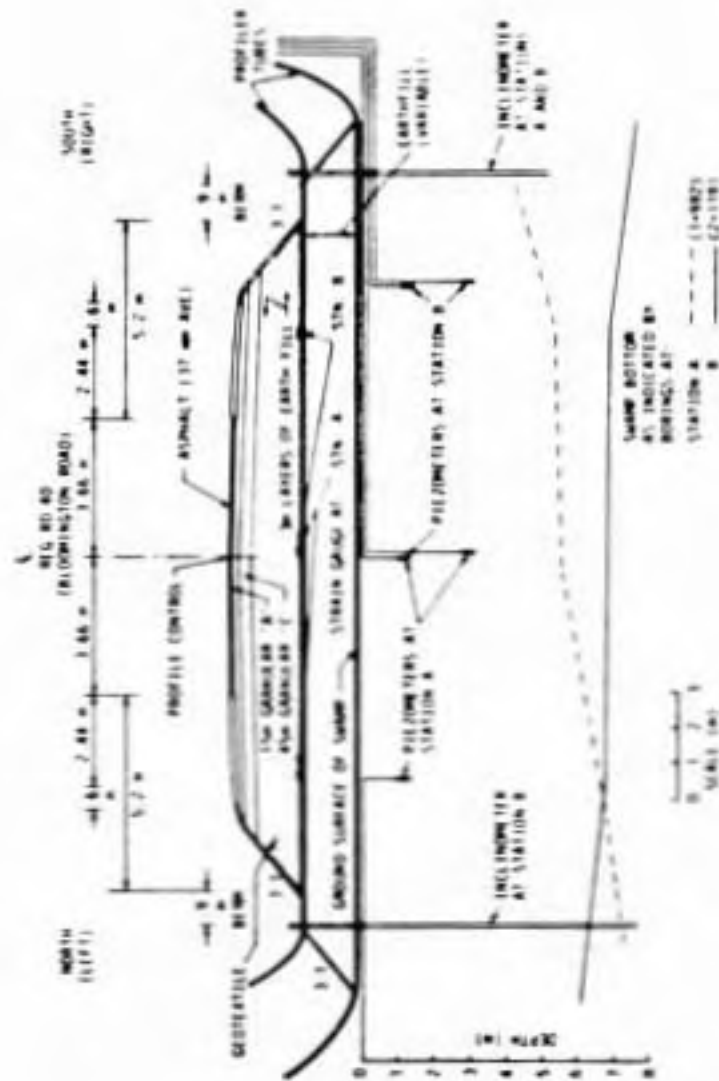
Cross section of Bloomington Side Road embankment [Case 29] (Rowe, et al., 1984a).
